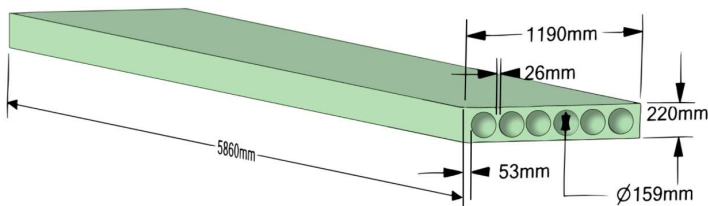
Full-scale view of the investigated reinforced concrete hollow slab
